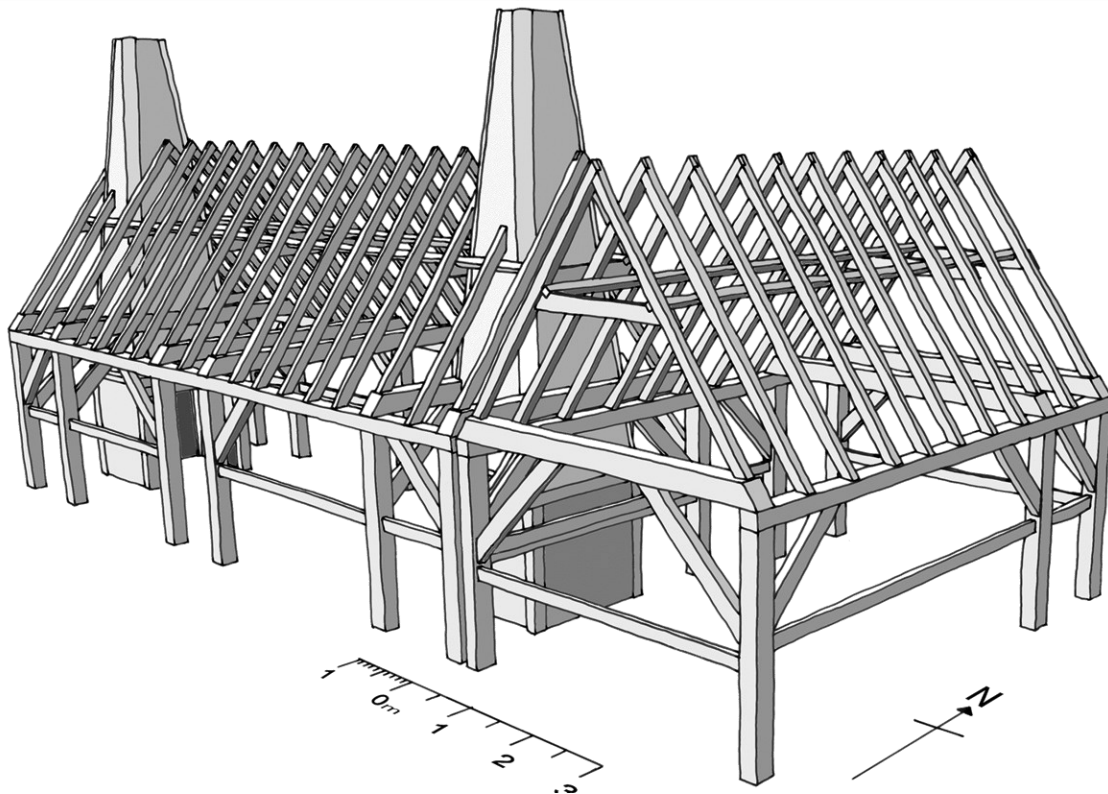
Reconstruction of the extension as a separate frame, as seen at Lavender Cottage, Thimbleby; it may have instead been jointed into the original frame
